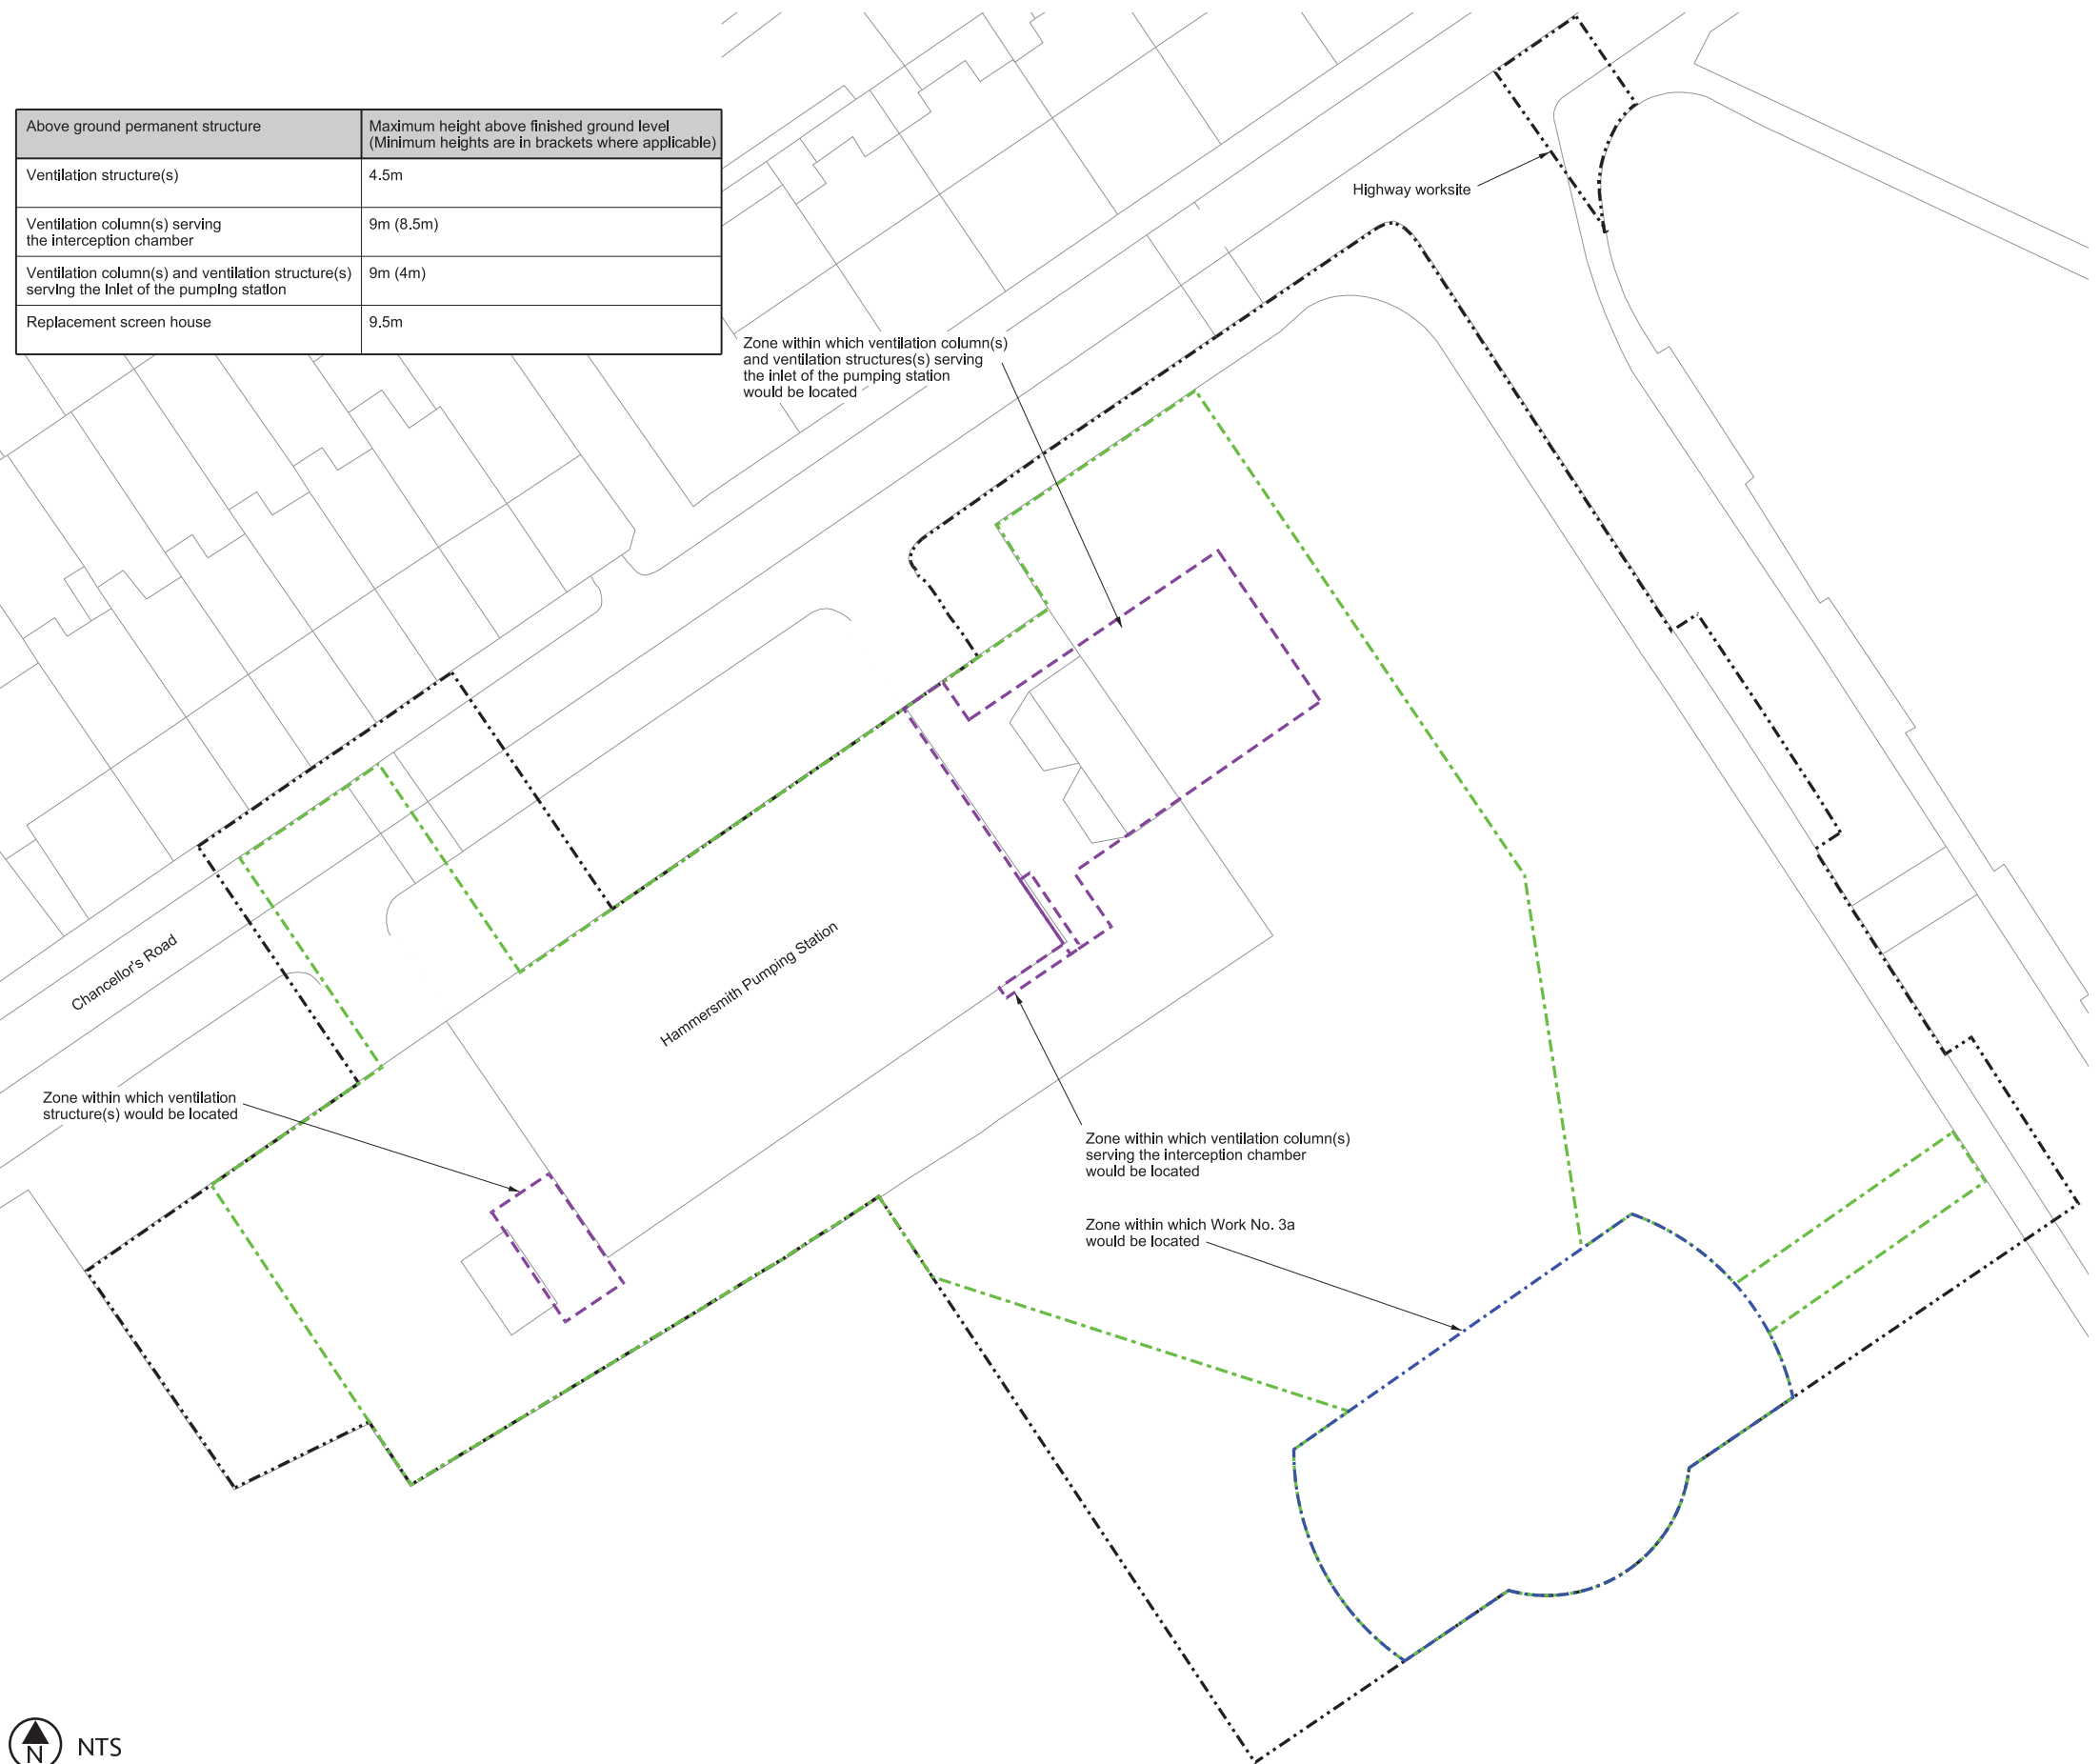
Site works parameter plan - refer to Site works parameter plan in the *Book of Plans
